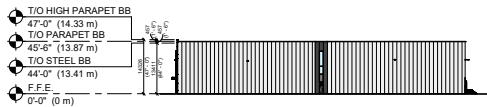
Industrial Building B East Elevation (typical concept design for industrial buildings on proposed site)
